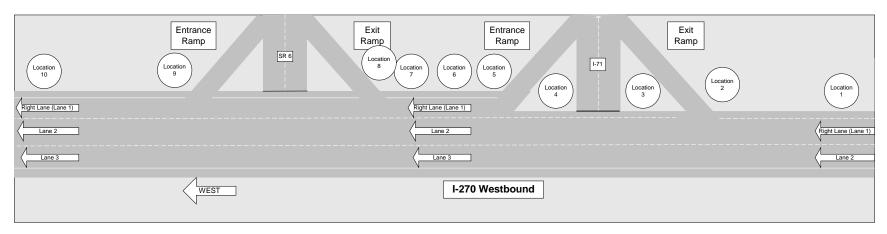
Drawing of Trailer Locations on I-270 Westbound after Construction
